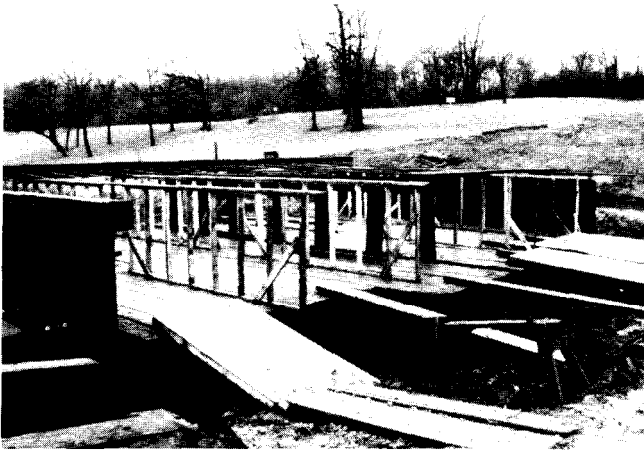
Scaffolding and floor erected for bridge construction. Floor and scaffolding were supported by temporary stringers connected to the bridge supports.
